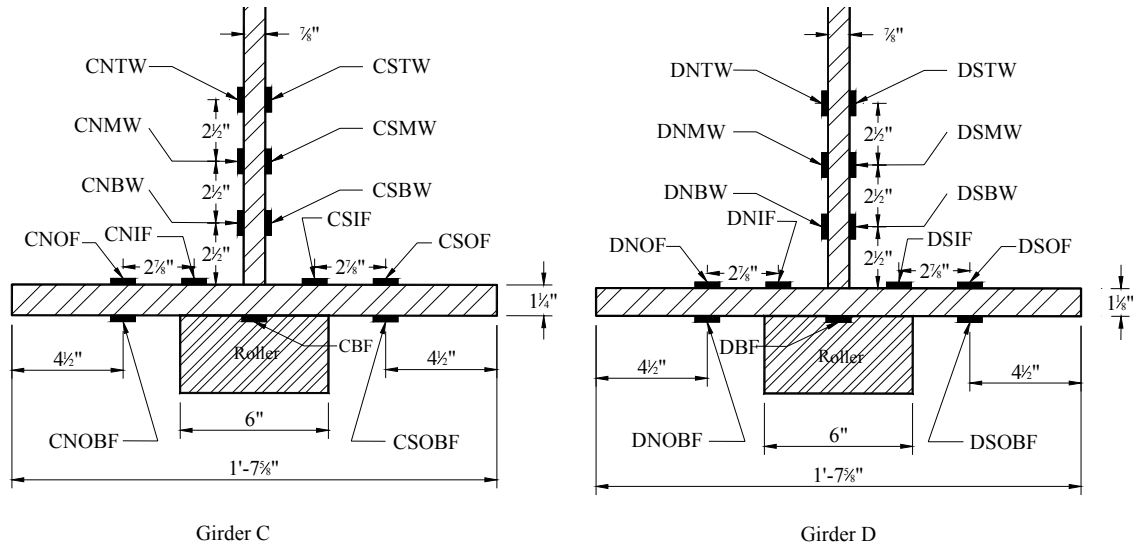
Girder instrumentation at IP 219' – Launch WB3.
